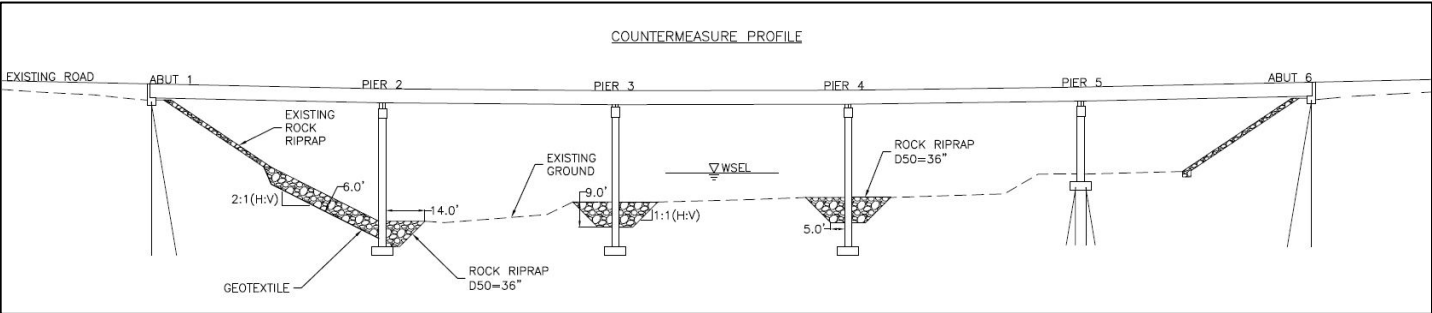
Cross-sectional view of Bridge E-10-A with recommended hydraulic scour countermeasures
